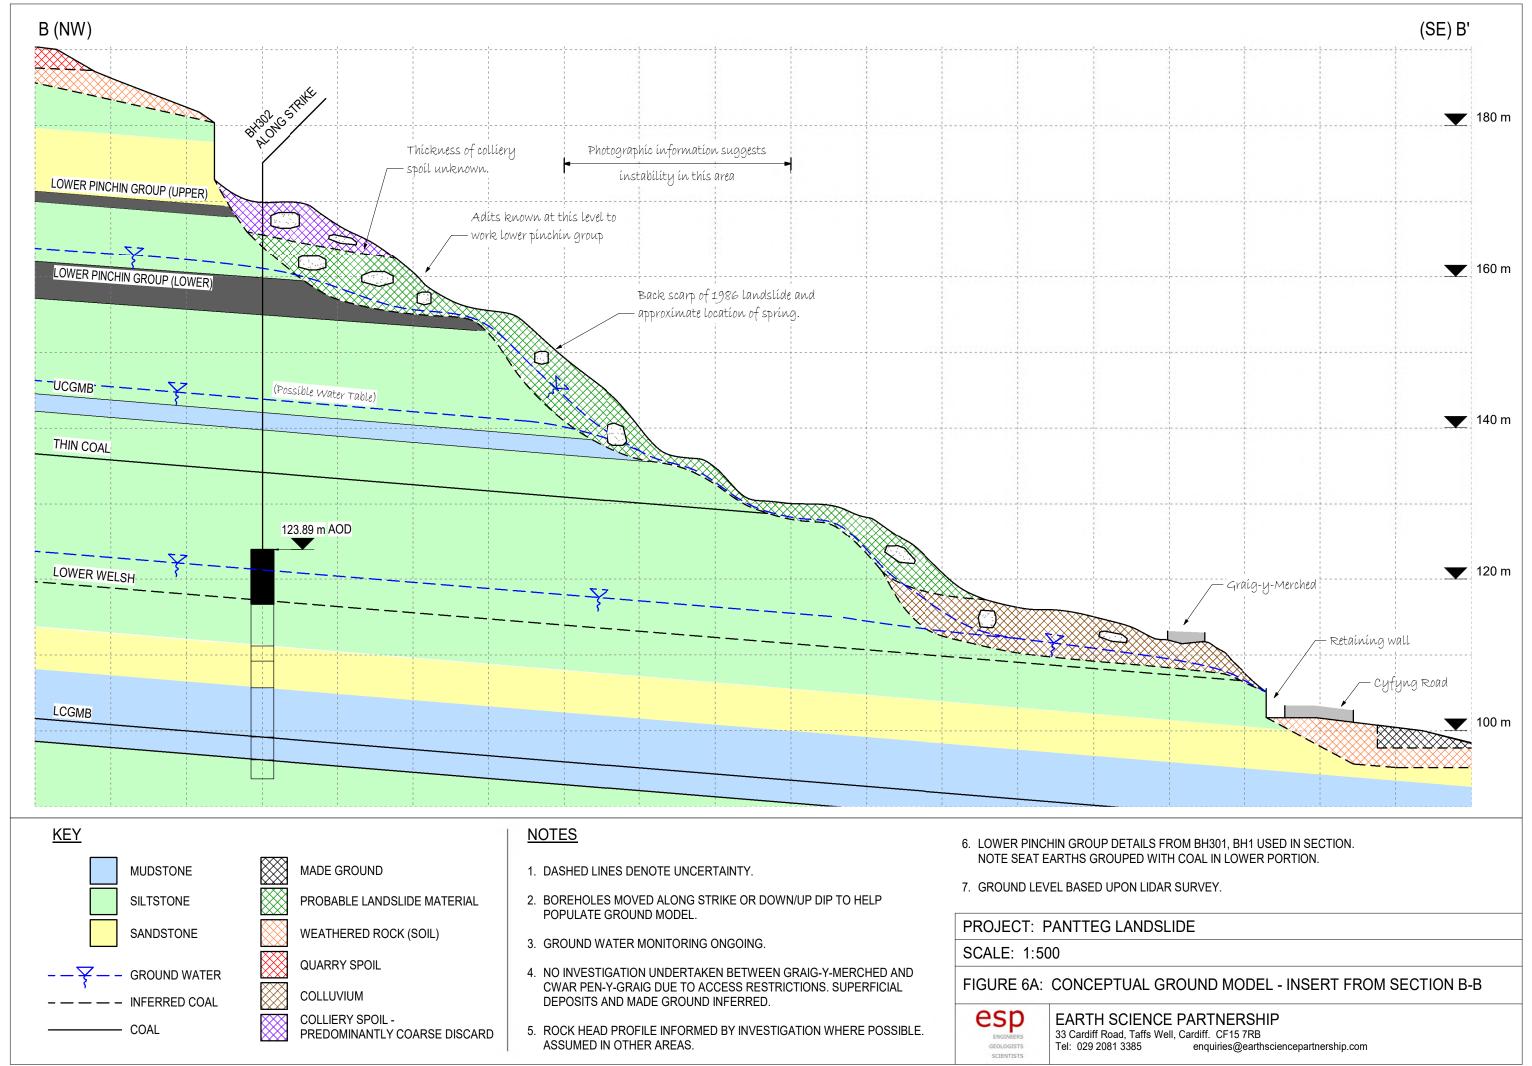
CONCEPTUAL GROUND MODEL - SECTION B-B
